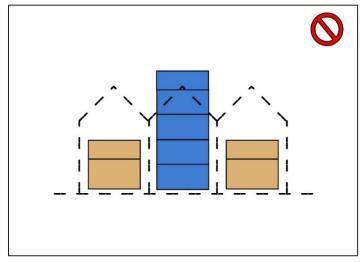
New infill building (blue) extends into daylight plane of the adjacent residential qualified historic building
